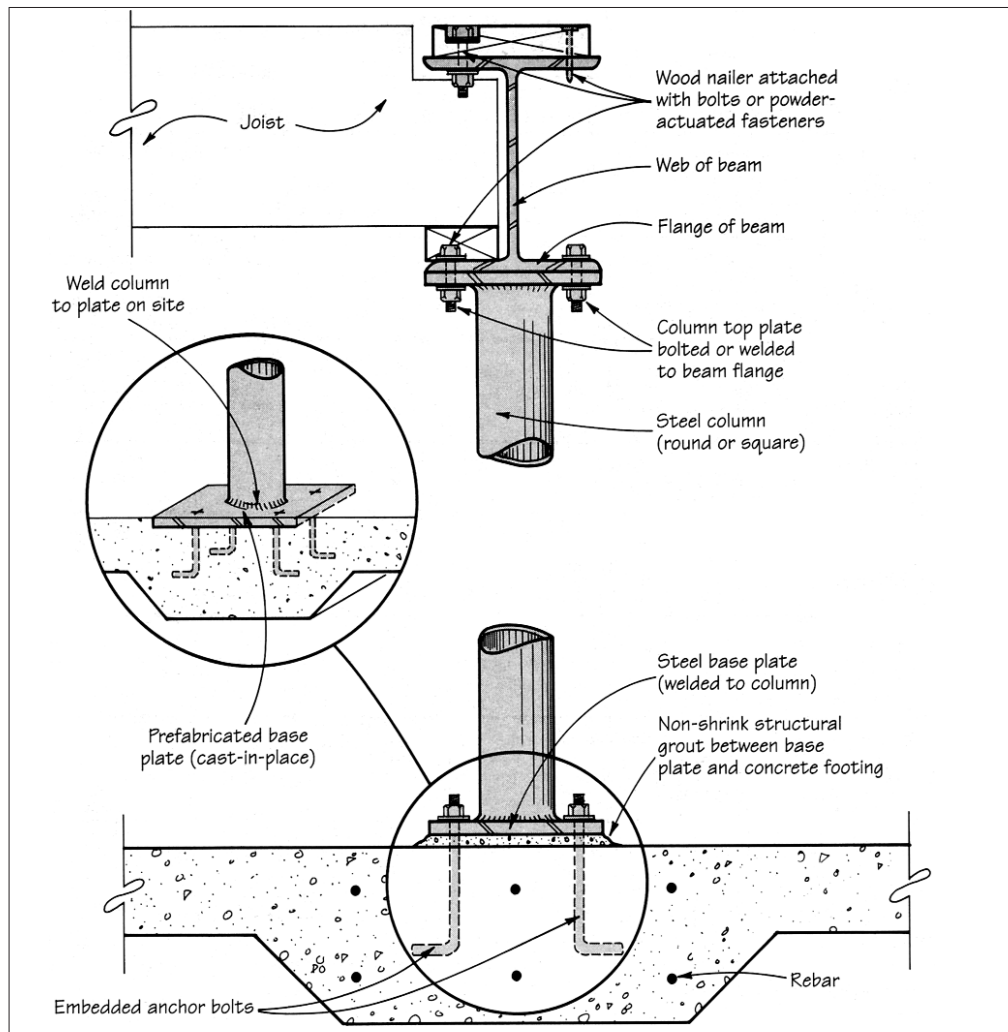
In most cases, workers on site can use ordinary wrenches to bolt columns to overhead beams and foundation anchor bolts. An alternative is to weld column plates to beam flanges, and weld the column bases to steel plates cast into the slab or footings (inset).
